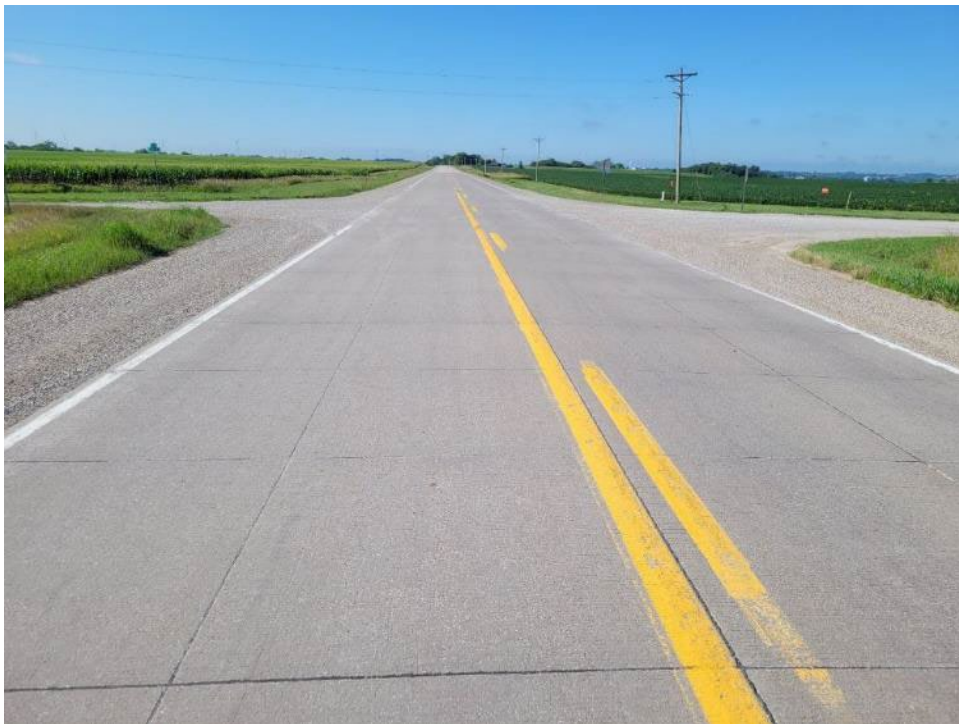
6-inch overlay 6 x 6 ft. Joint Spacing
